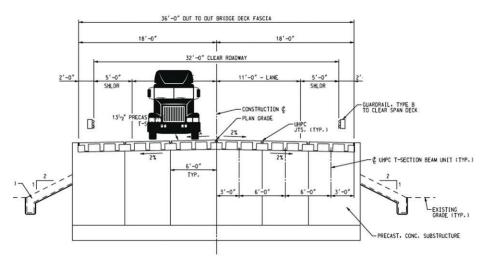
Bridge cross section. All Photos and Figures: HiPer Fiber LLC/St. Clair County Road Commission.
